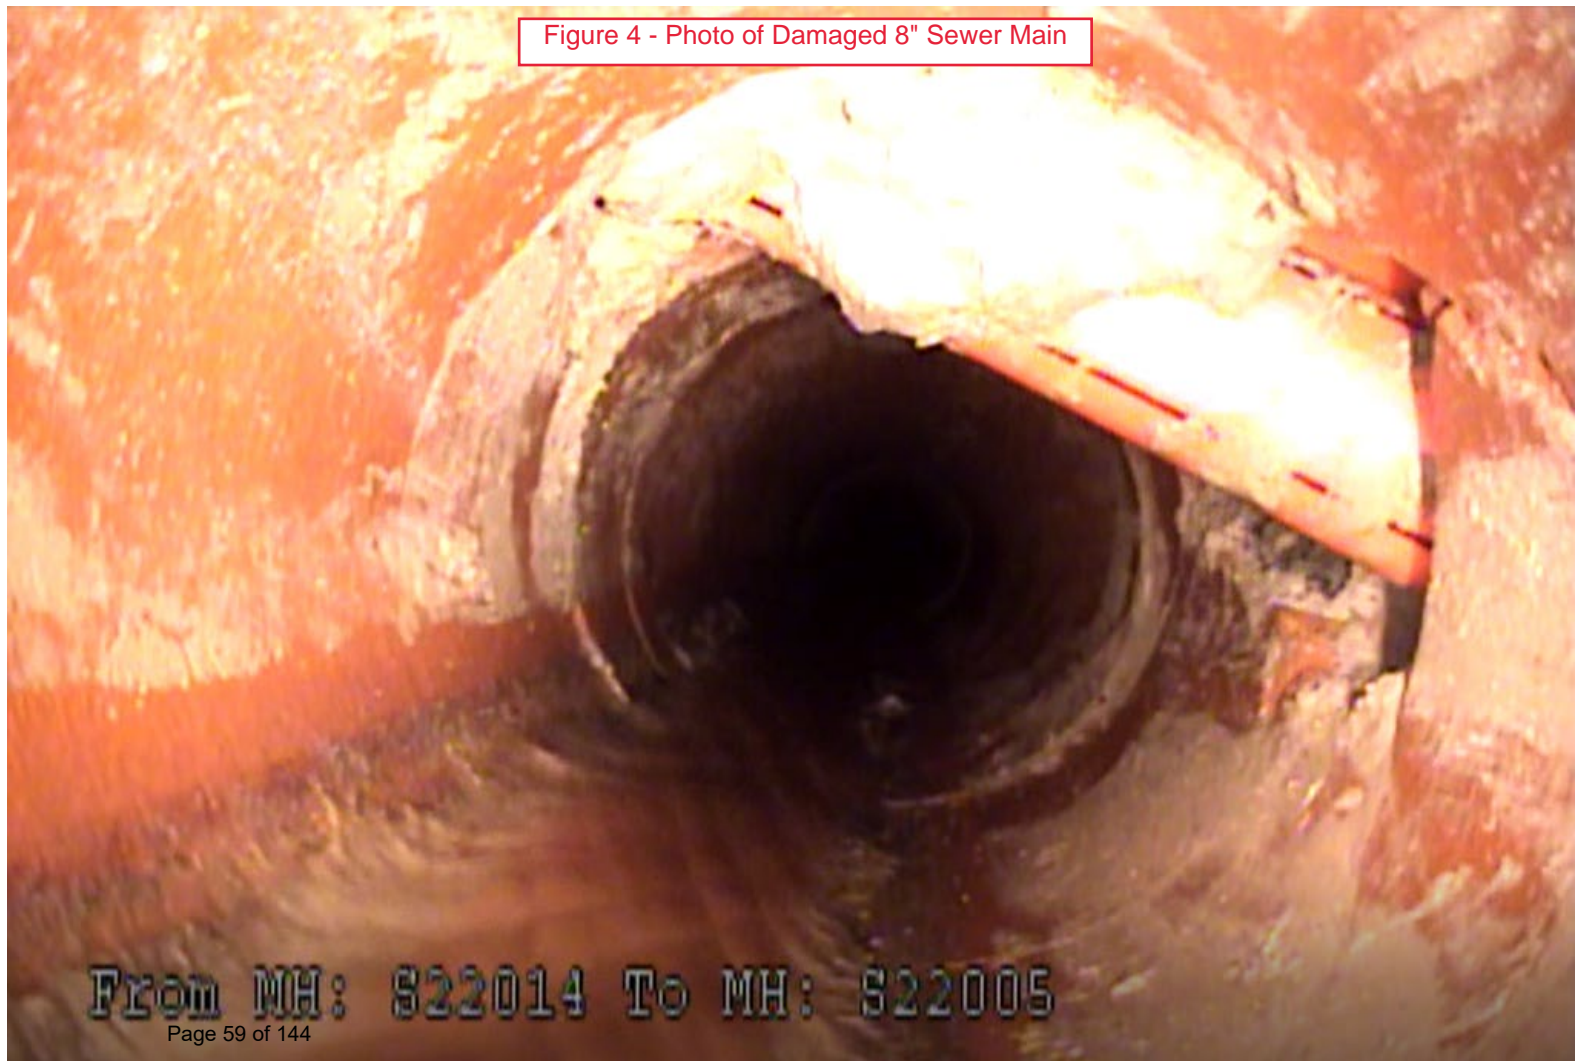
Photo of Damaged 8" Sewer Main
